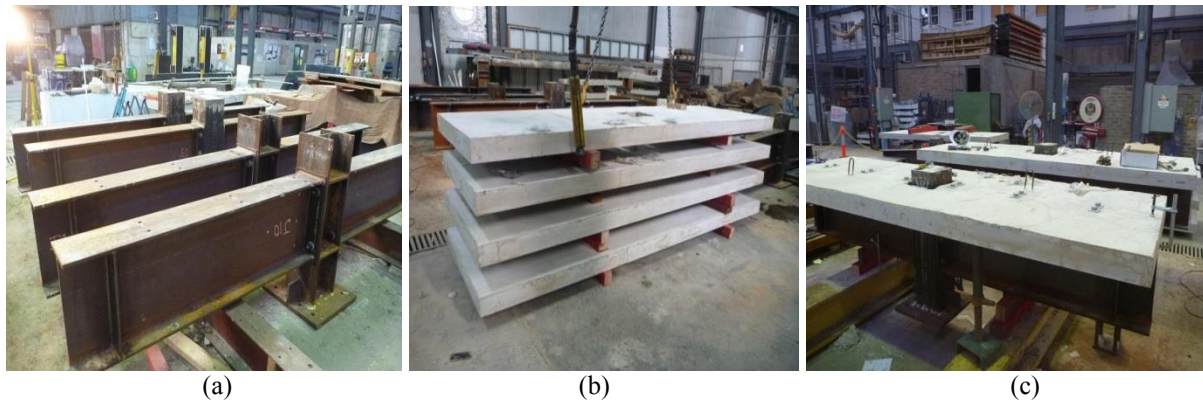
(a) Assembled cruciform steel joints before installation of precast concrete slabs; (b) precast concrete slabs after de-molding; (c) specimens CJ1 and CJ2 ready to be tested.
